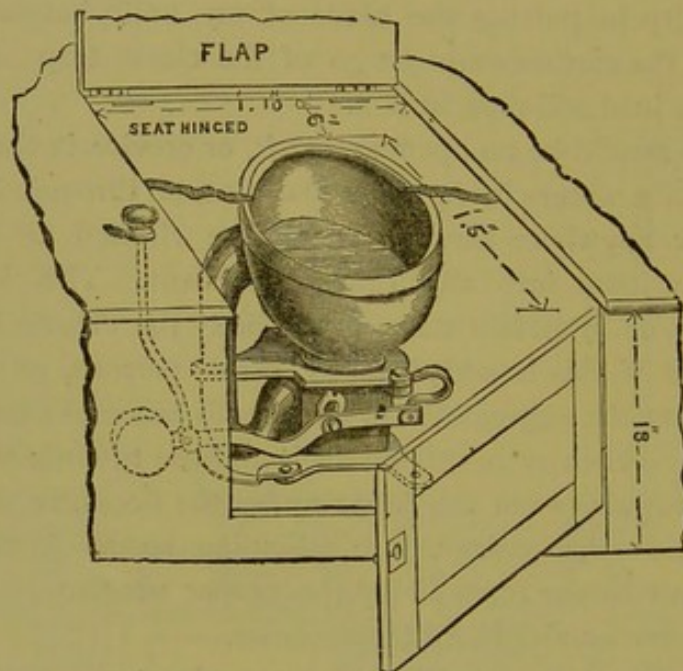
Perspective view of a Valve-closet and w.c. seat.
